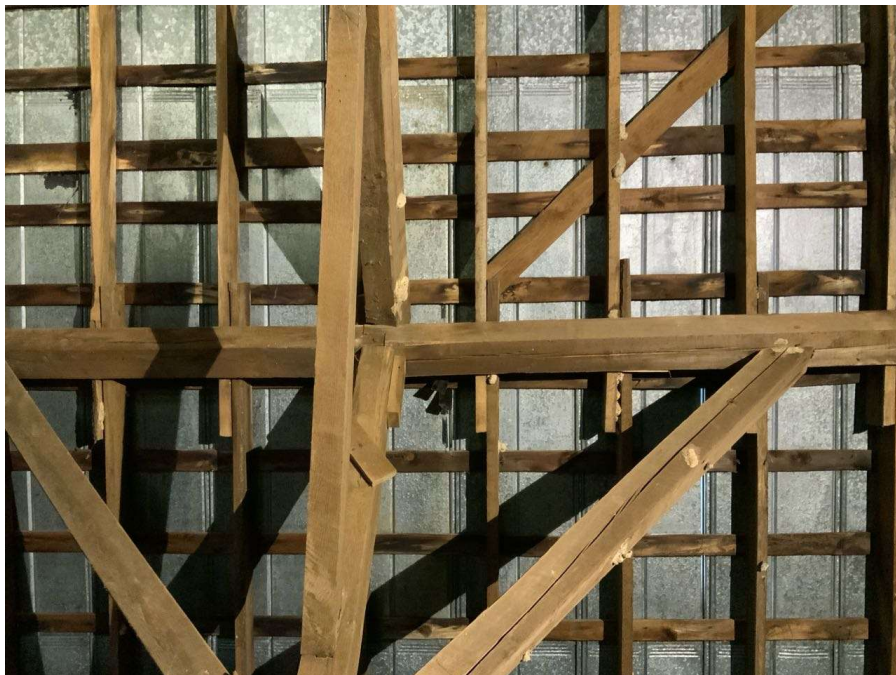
Horizontal framing member in west wing of hayloft is twisting towards the west at the south bearing. Member at Gridline C looking south shown.
